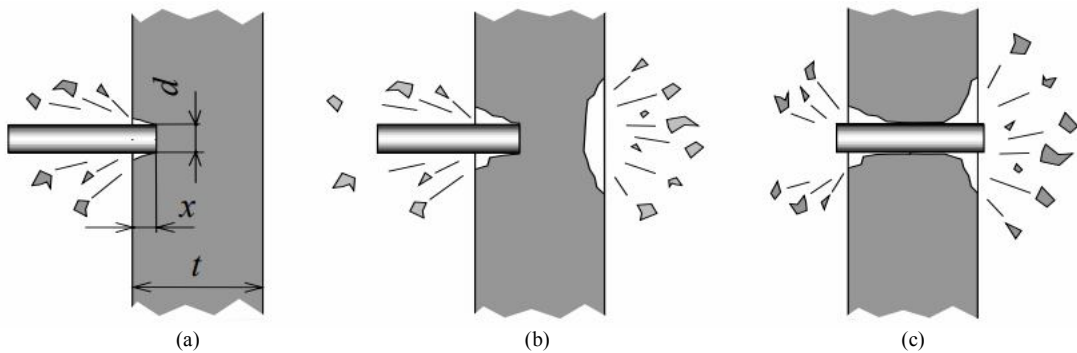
Types of damage to a concrete barrier when struck by a solid body: (a) spalling from the front surface; (b) cracking from the inside; (c) punching
